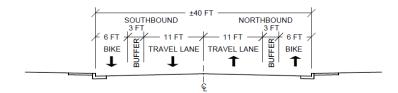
Proposed Typical Section between Centre Street and Dalma Drive
